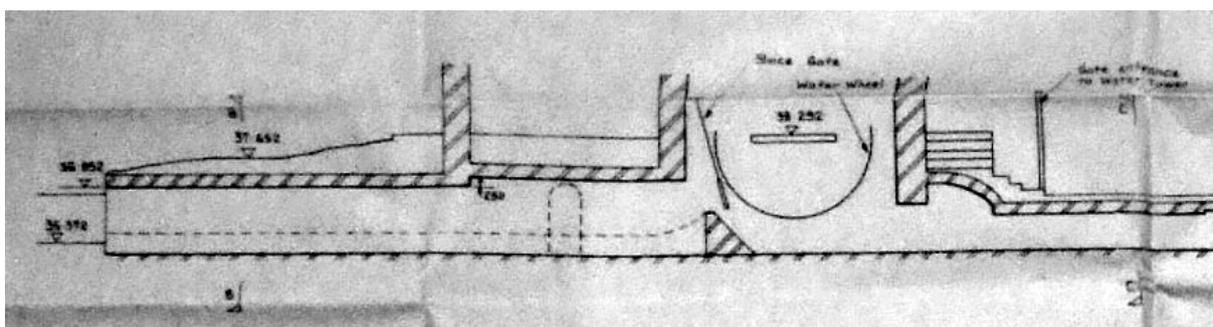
Section along the Water Tower wheel pit and culverts. From a plan by the London Borough of Sutton.¹³
